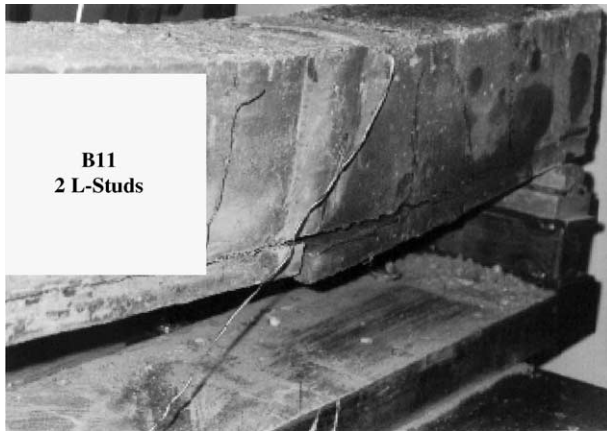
Bond failure in beam specimen B11 (2L studs) at ultimate.
